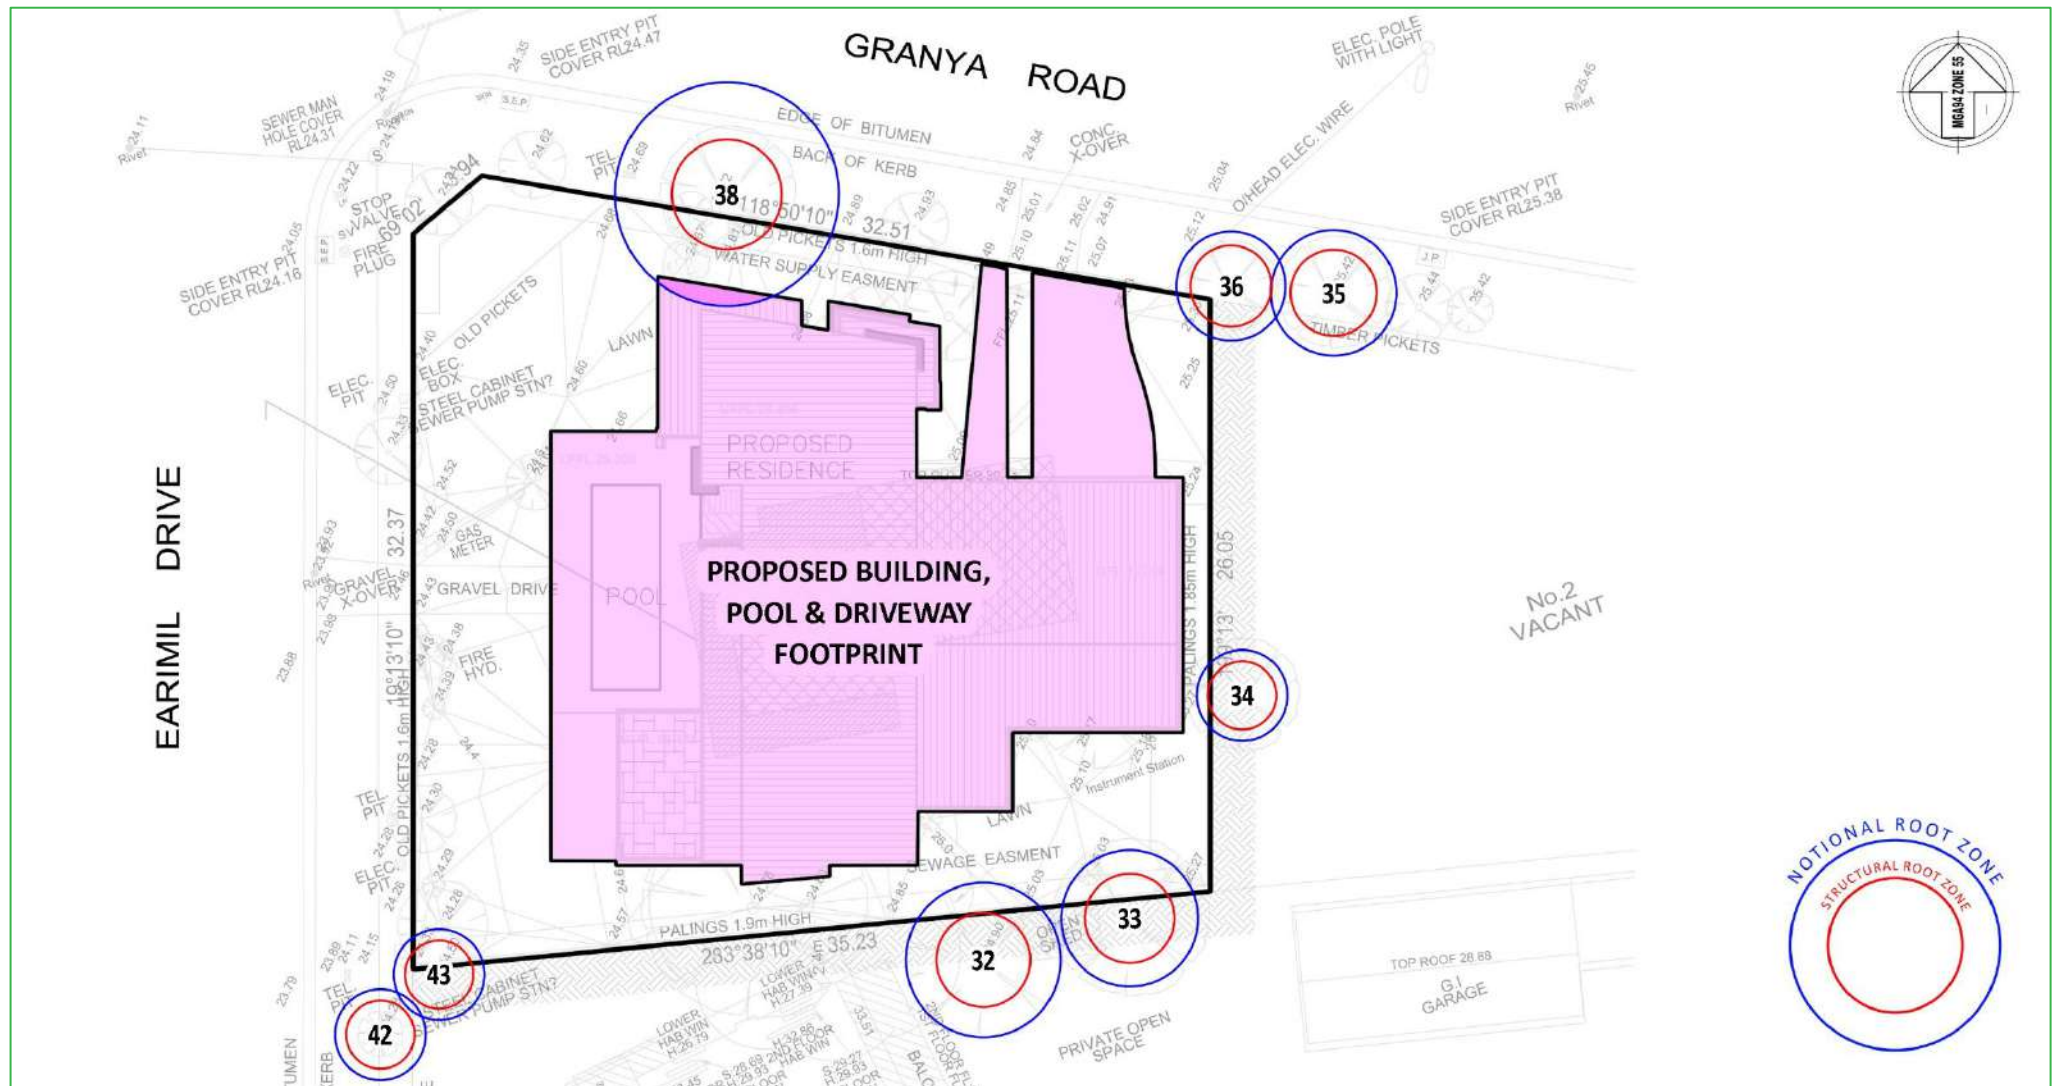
Proposed site plan (Space + Light Design Co, 2026) with protection zones drawn to scale (J. Miller)
